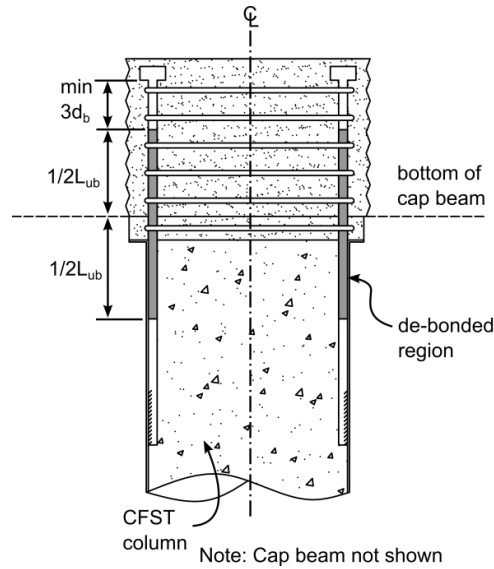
Welded Dowel Connection Debonding Dimensions
